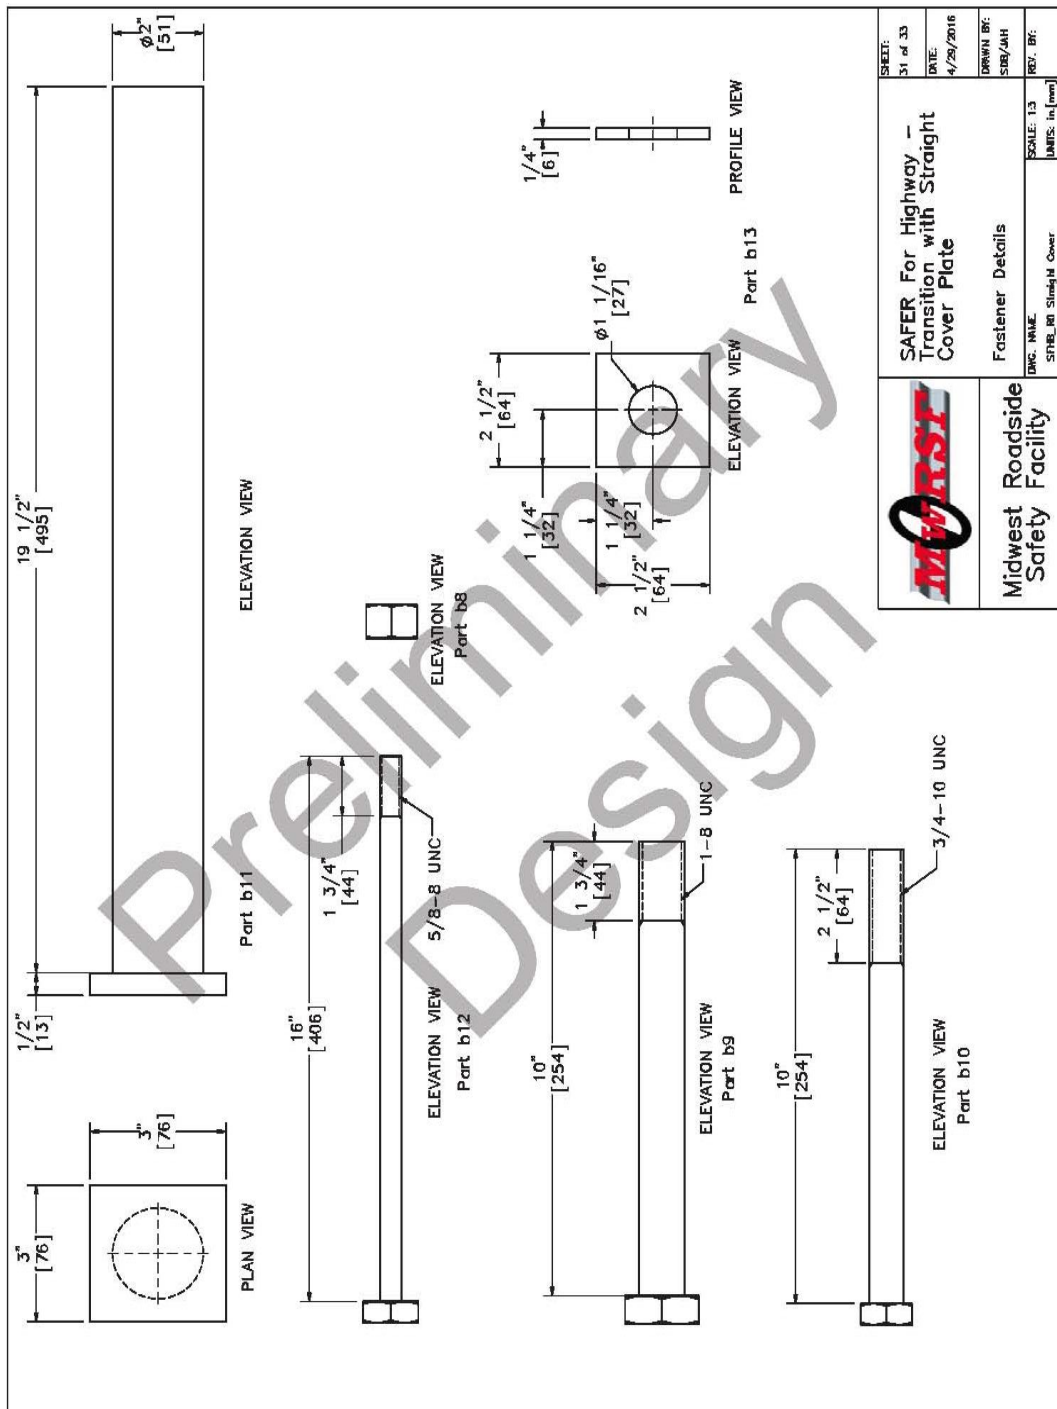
Fastener Details, Straight Cover Plate, RESTORE Barrier Transition
